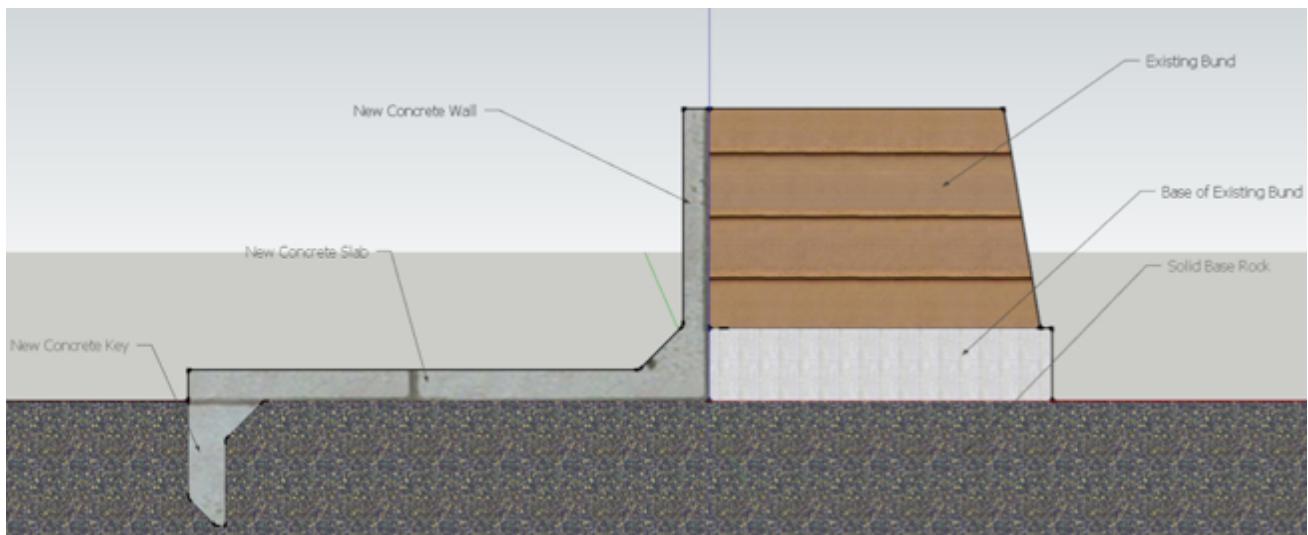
Schematic of proposed Kurlod bund repair plan.
